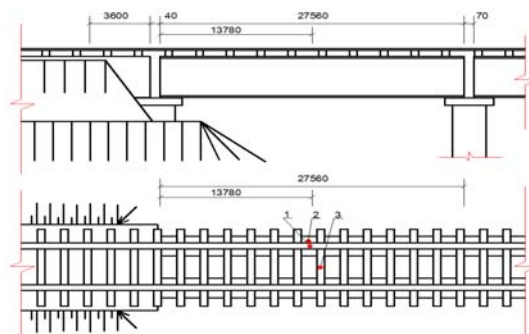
Scheme of a metal span structure with the arrangement of vibration sensors on structural elements:
